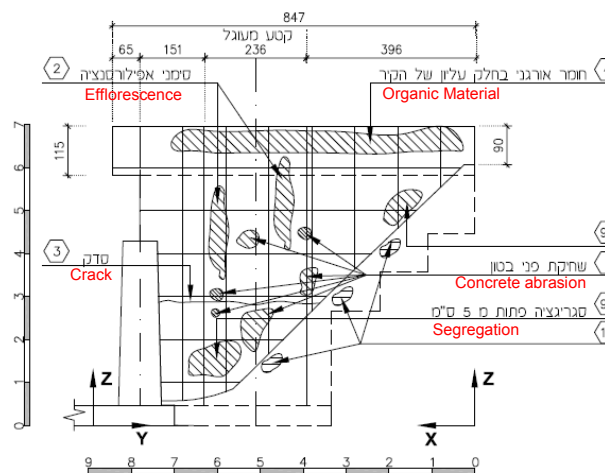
Elevation of Wingwall 2 with defects marking (similar defects at wing walls 1 & 4)
